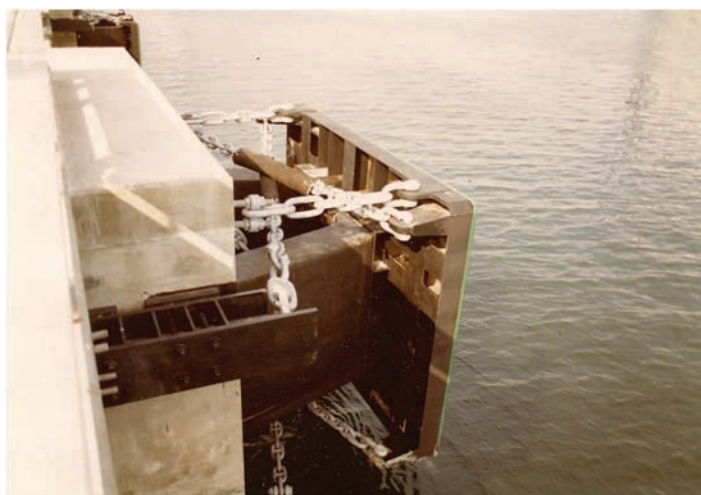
Dual single-element fender units mounted vertically with fender face panel and retention chains
